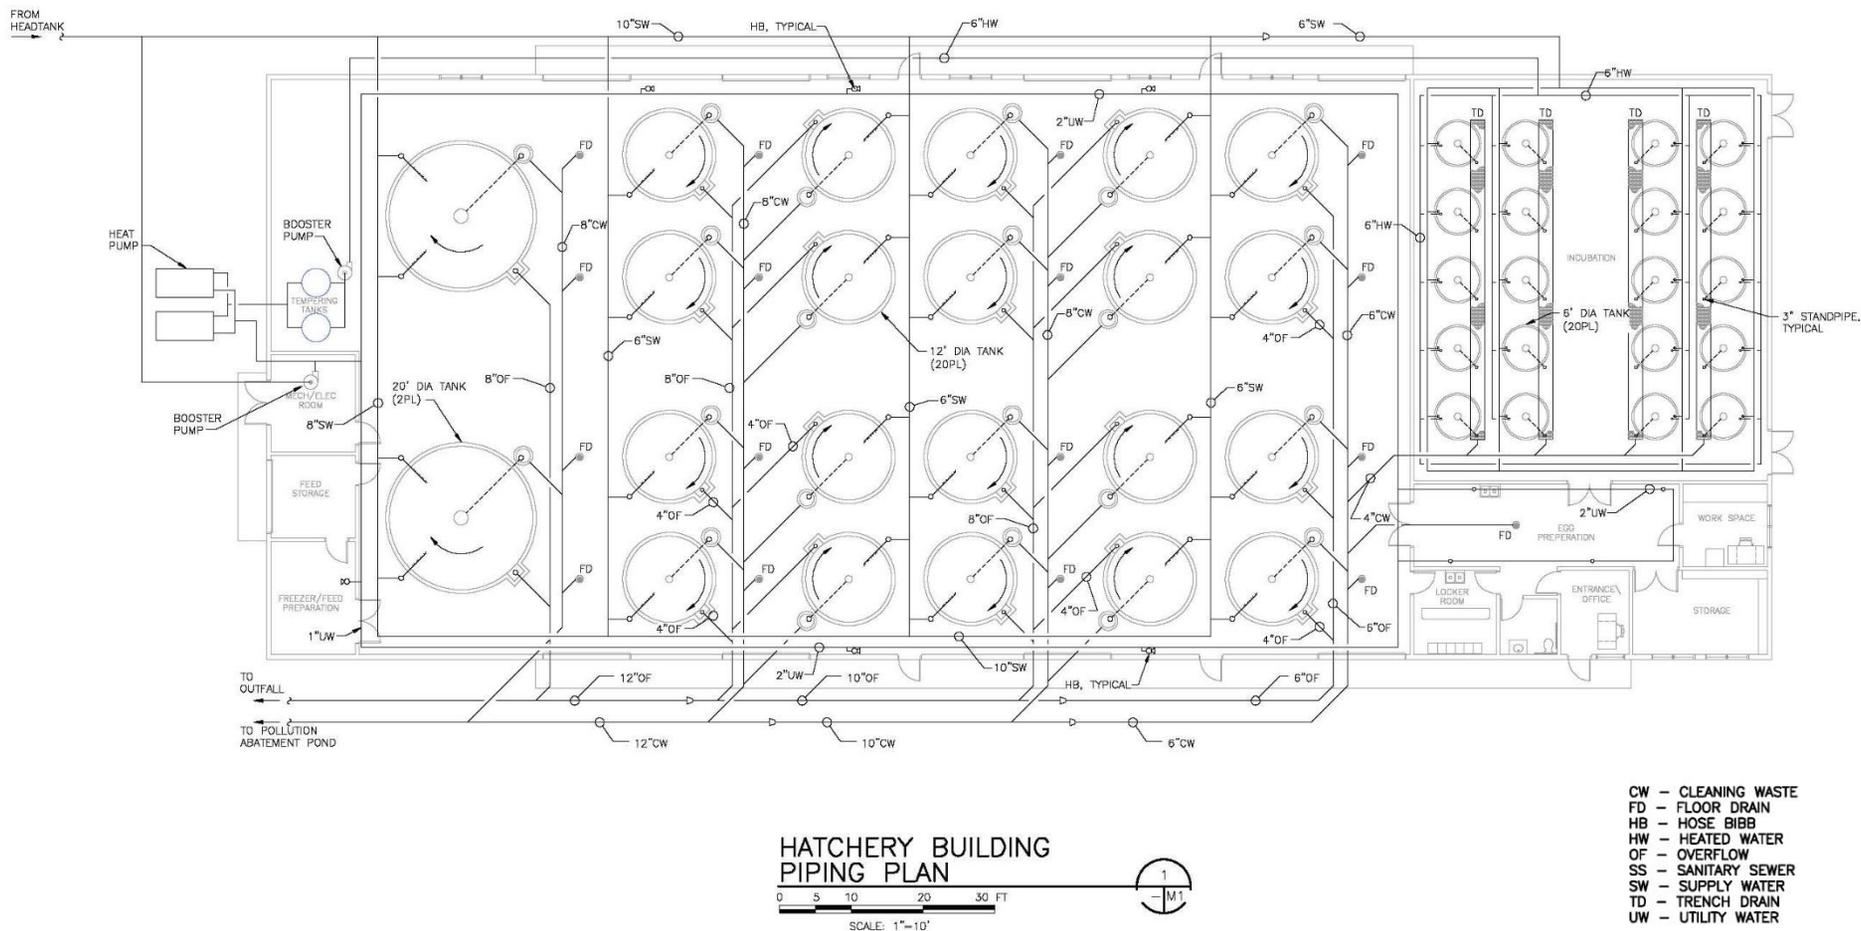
Conceptual hatchery building piping plan for the proposed sturgeon production facility at Marion Drain hatchery.
